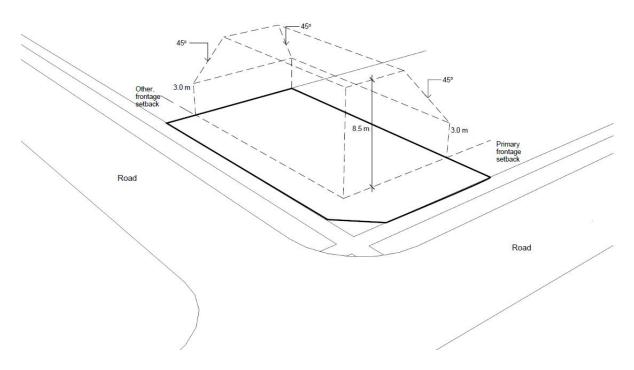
Building envelope for corner lots as required by clause 10.4.2 A3(a)
